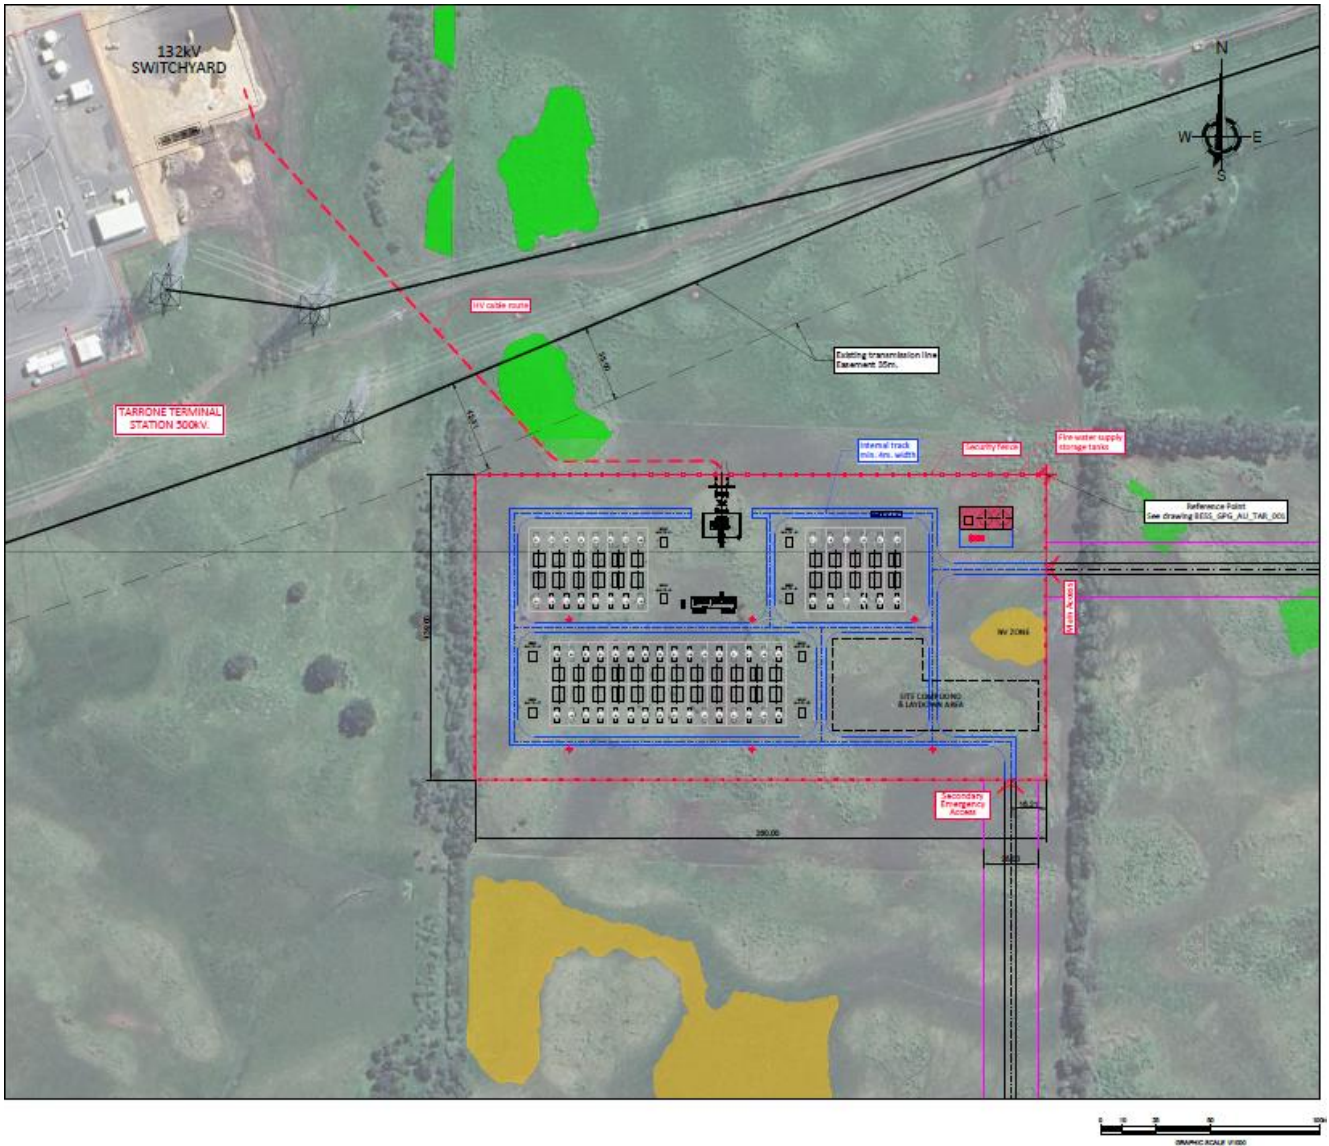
General Arrangement Plan (Source: GPG Plan BESS_GPG_AU_TAR_002 Rev 4)
